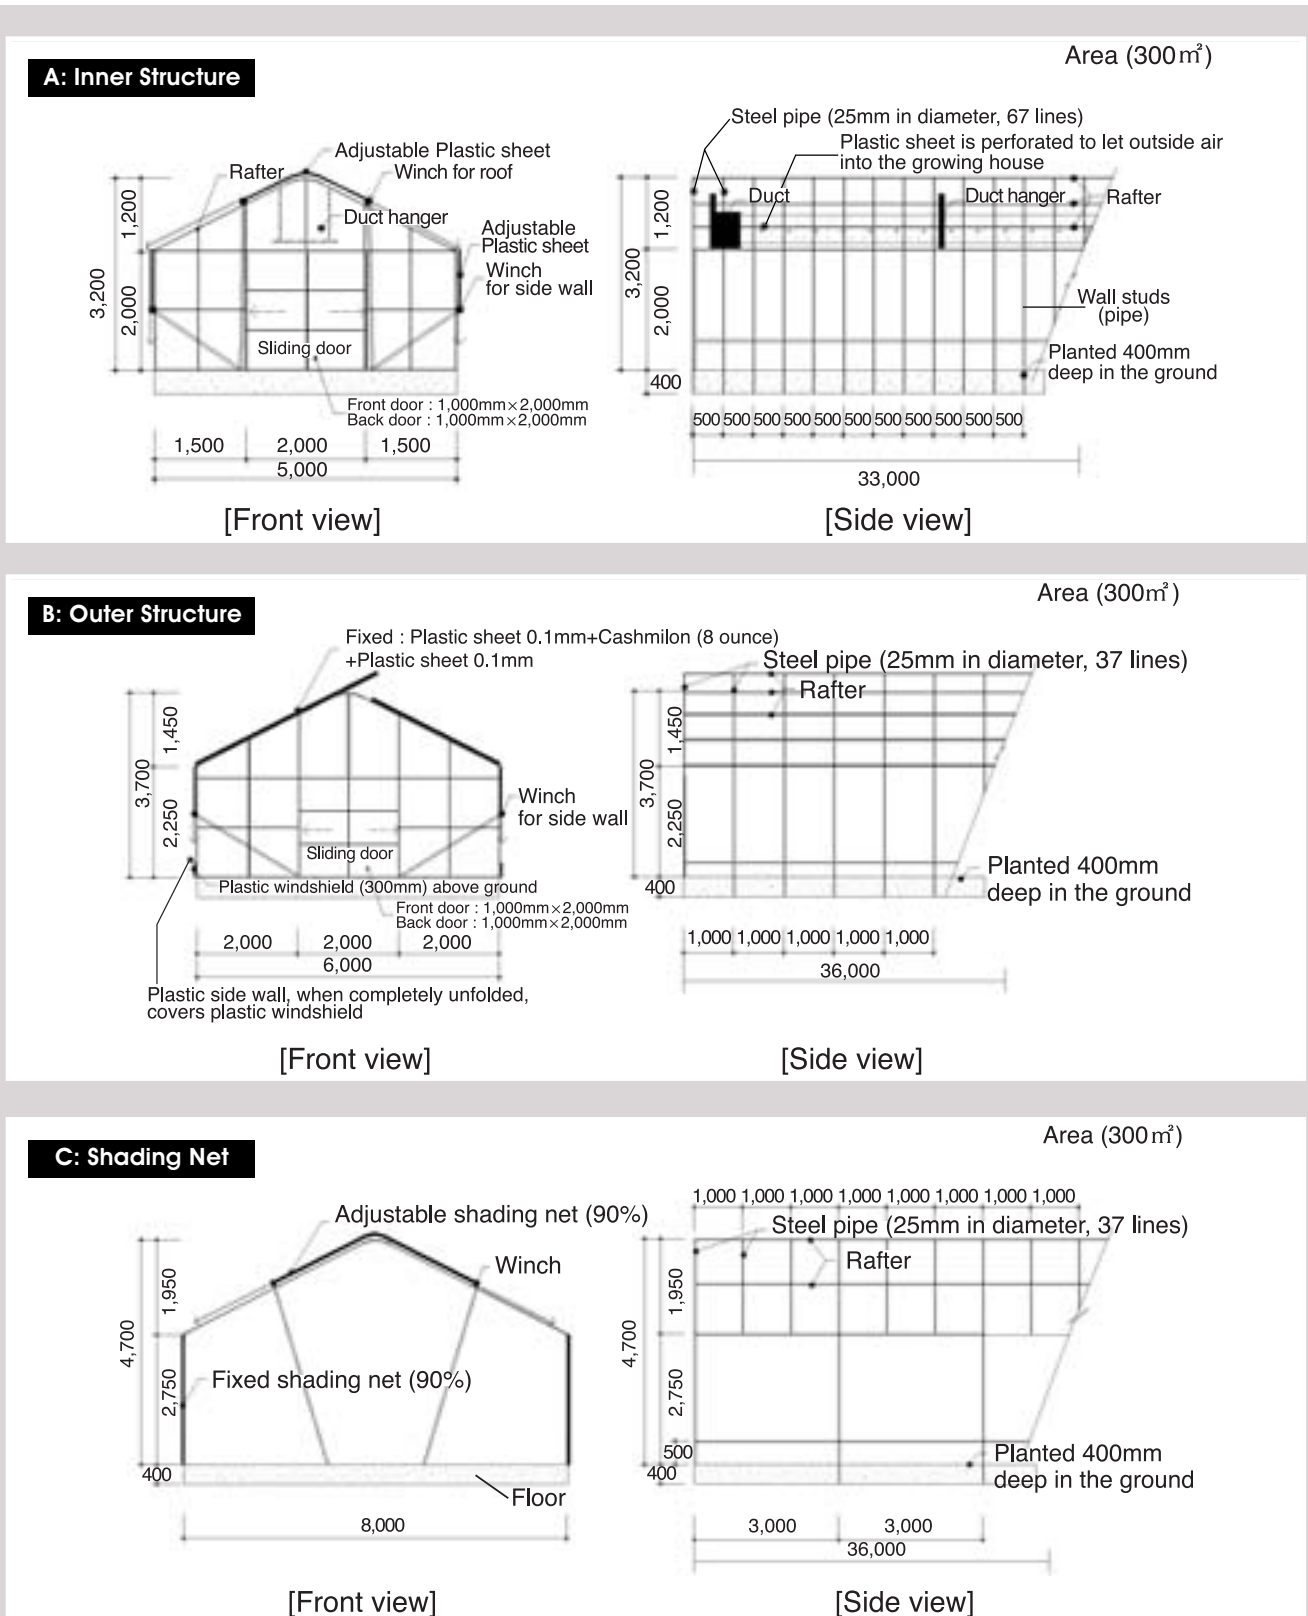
Plans for the three folded overlapping open roof growing house A: Inner structure B: Outer structure C: Shading net structure
